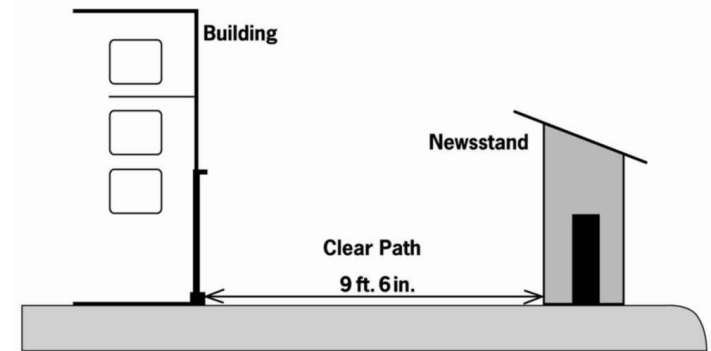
Typical full block front plan showing clear path for property – line newsstand.
